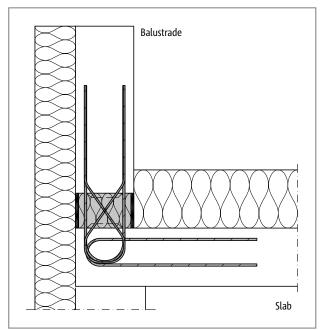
Schöck Isokorb® XT type A: Connection to a balustrade (XT type A-MM2)
